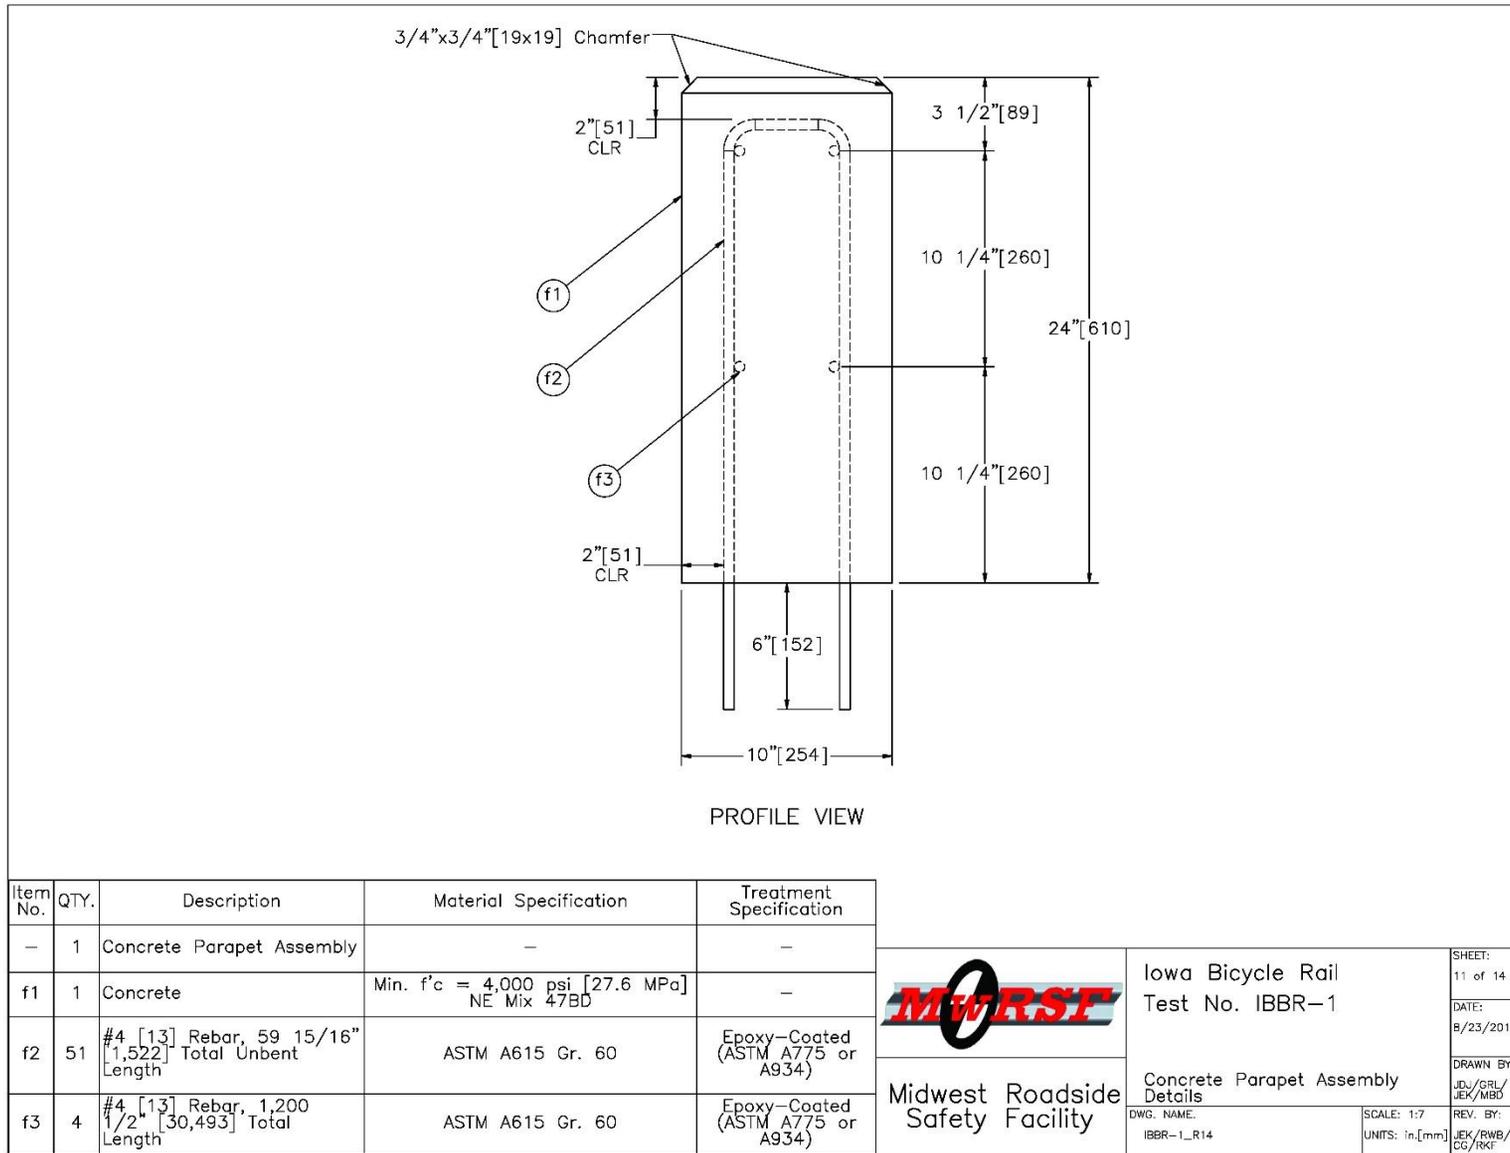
Concrete Parapet Assembly Details, Test No. IBBR-1
